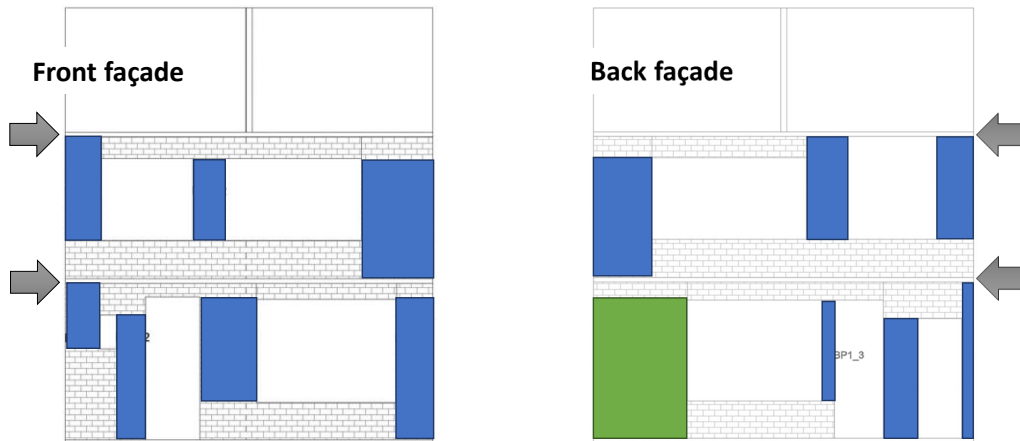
Failure of the piers of the front and back façades for positive loading. The blue colour represents a flexural failure and the green colour a shear failure.
